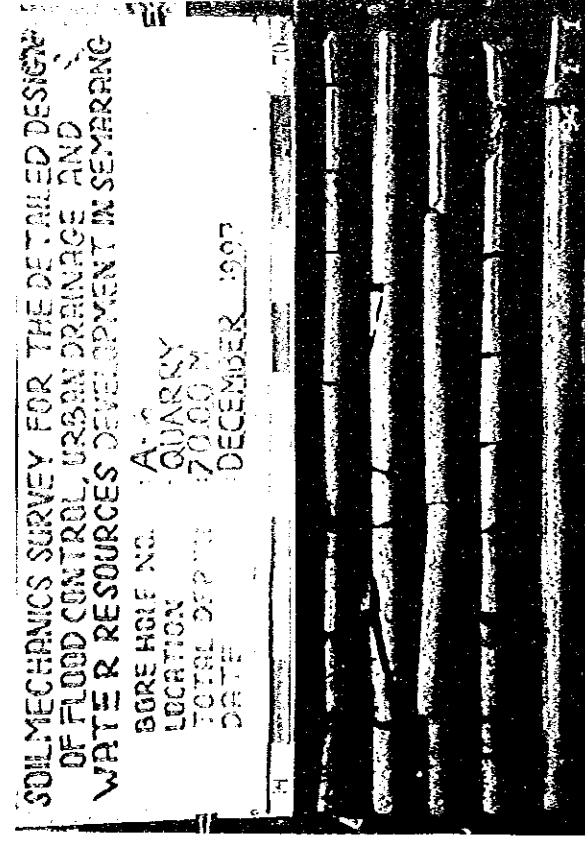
Drilling Core Photograph of Bore Hole No. A - 6 (3 of 3)
